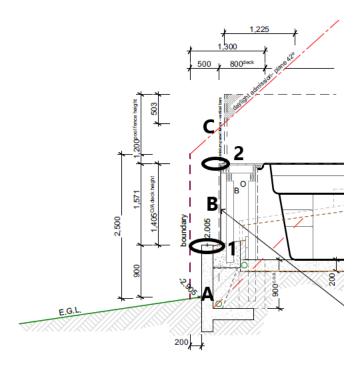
Extract from submitted plans for the pool barrier, showing various zones of its construction
